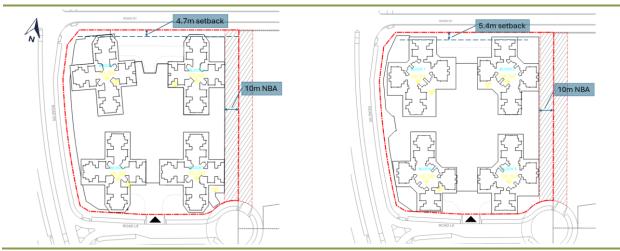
Master Layout Plan of Base Scheme (left) and Proposed Scheme (right) of Area 114
